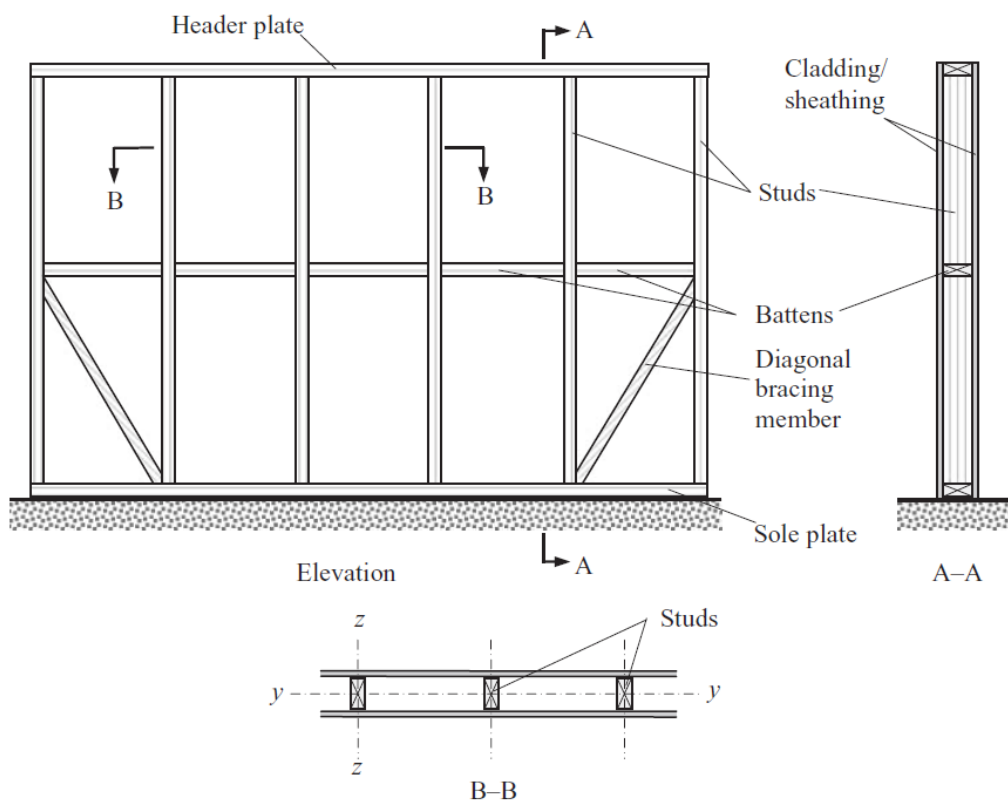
Structure of a timber wall (Porteous & Kermani, 2007).
